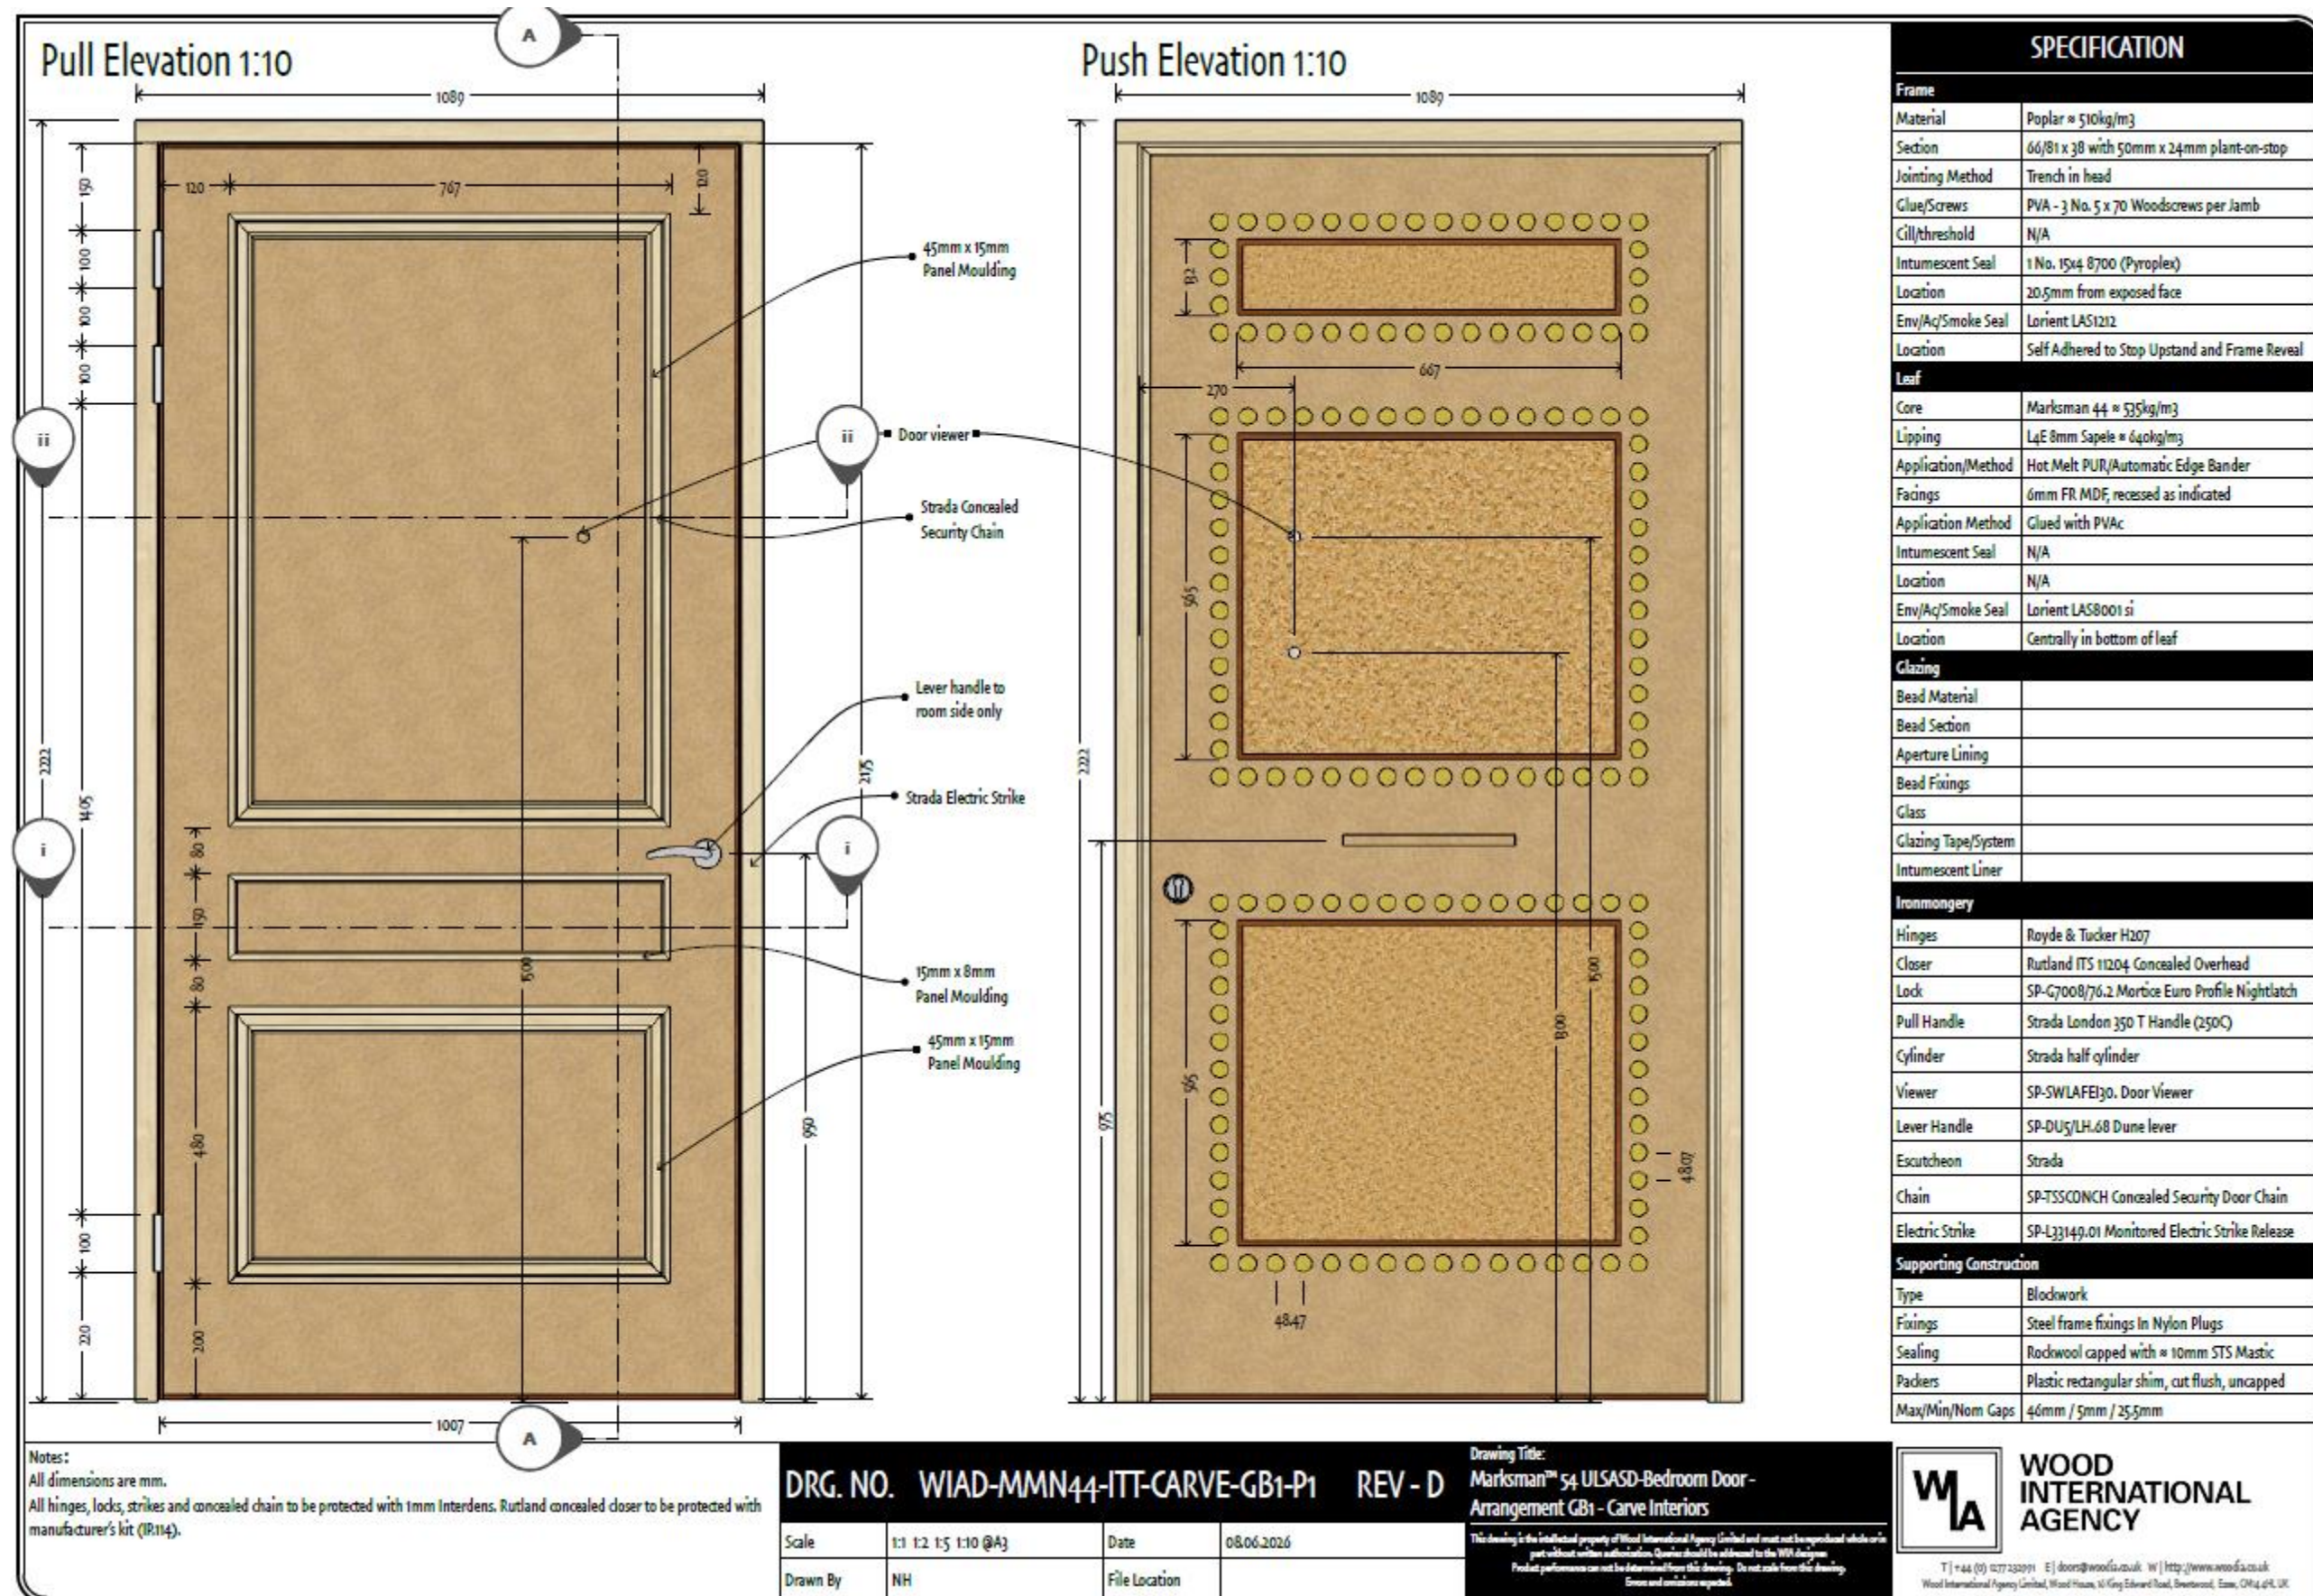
Doorset B - Drawing No. WIAD-MMN44-ITT-CARVE-GB1-P1 Page 1
